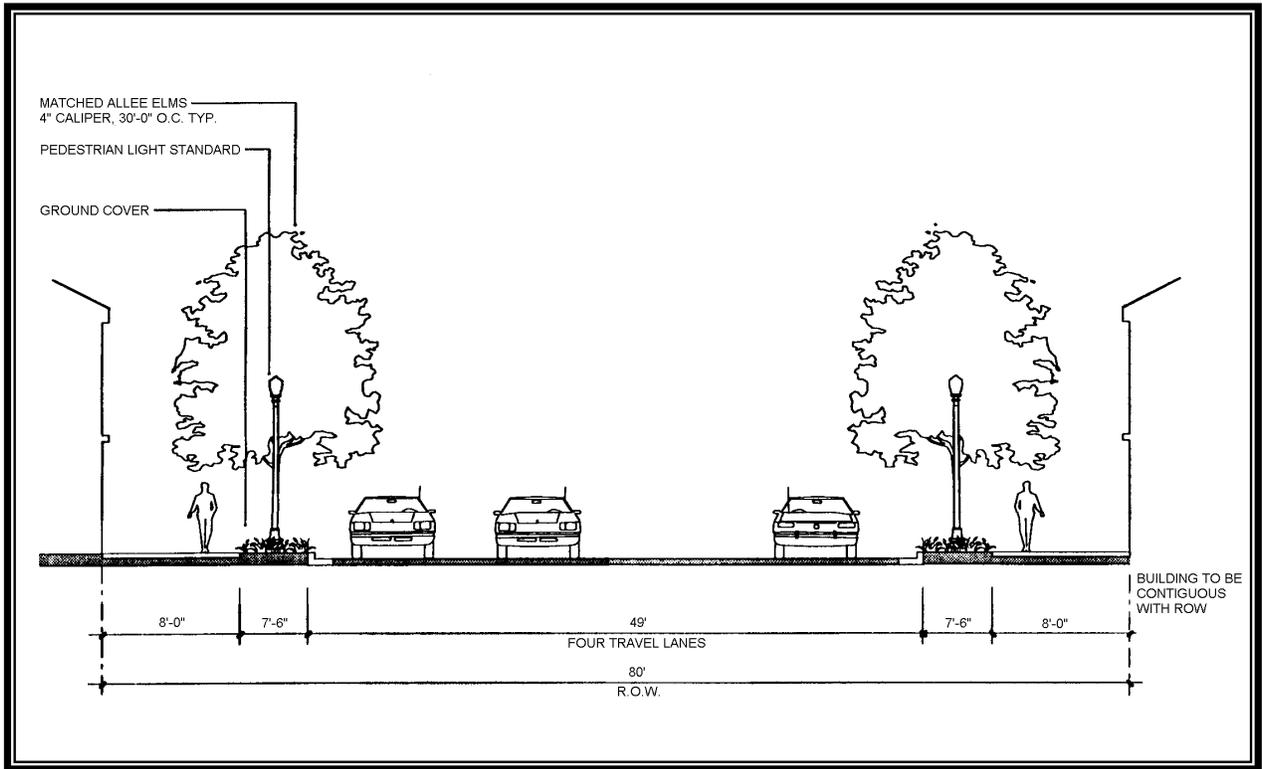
Bear Creek Parkway at Town Center (Undivided Cross Section)
